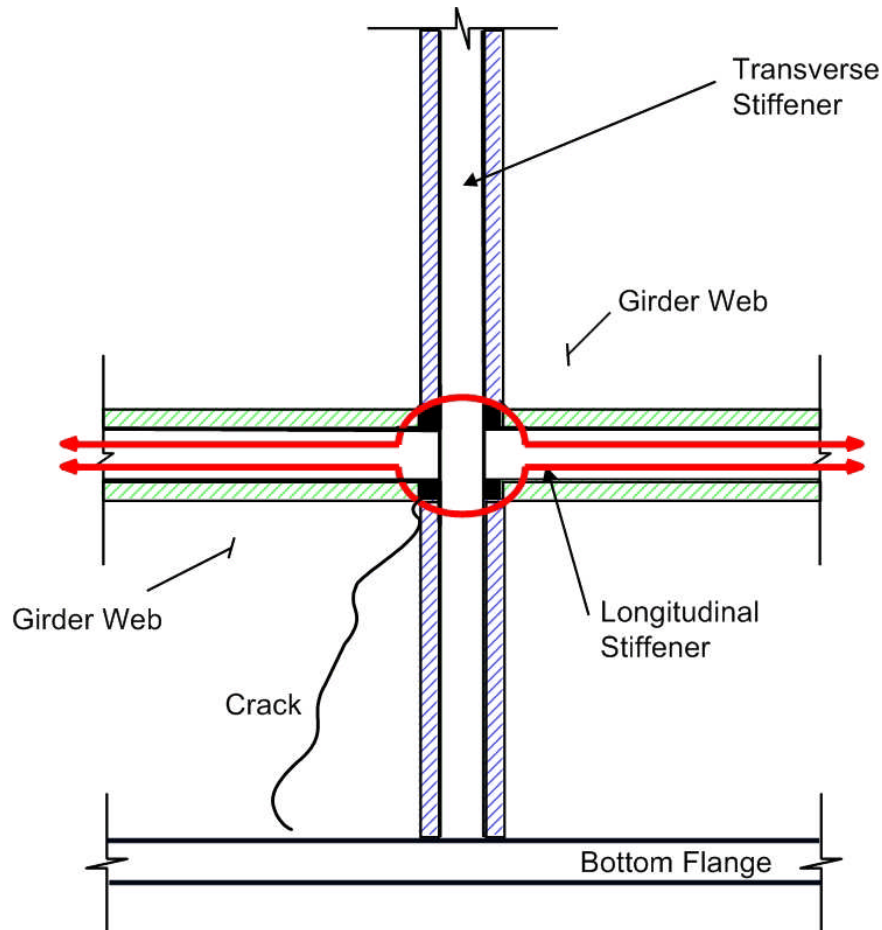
Potential Crack Formation due to Intersecting Welds
